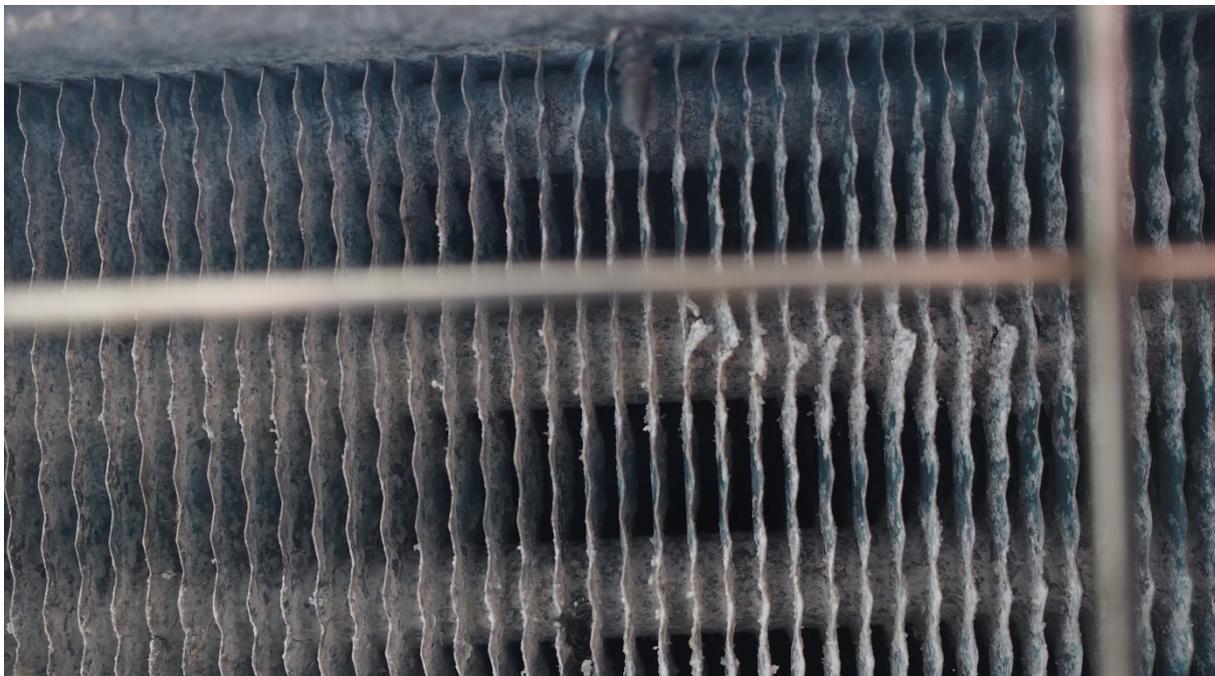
; Heat Pump:- Corrosion to Evaporator Fins
